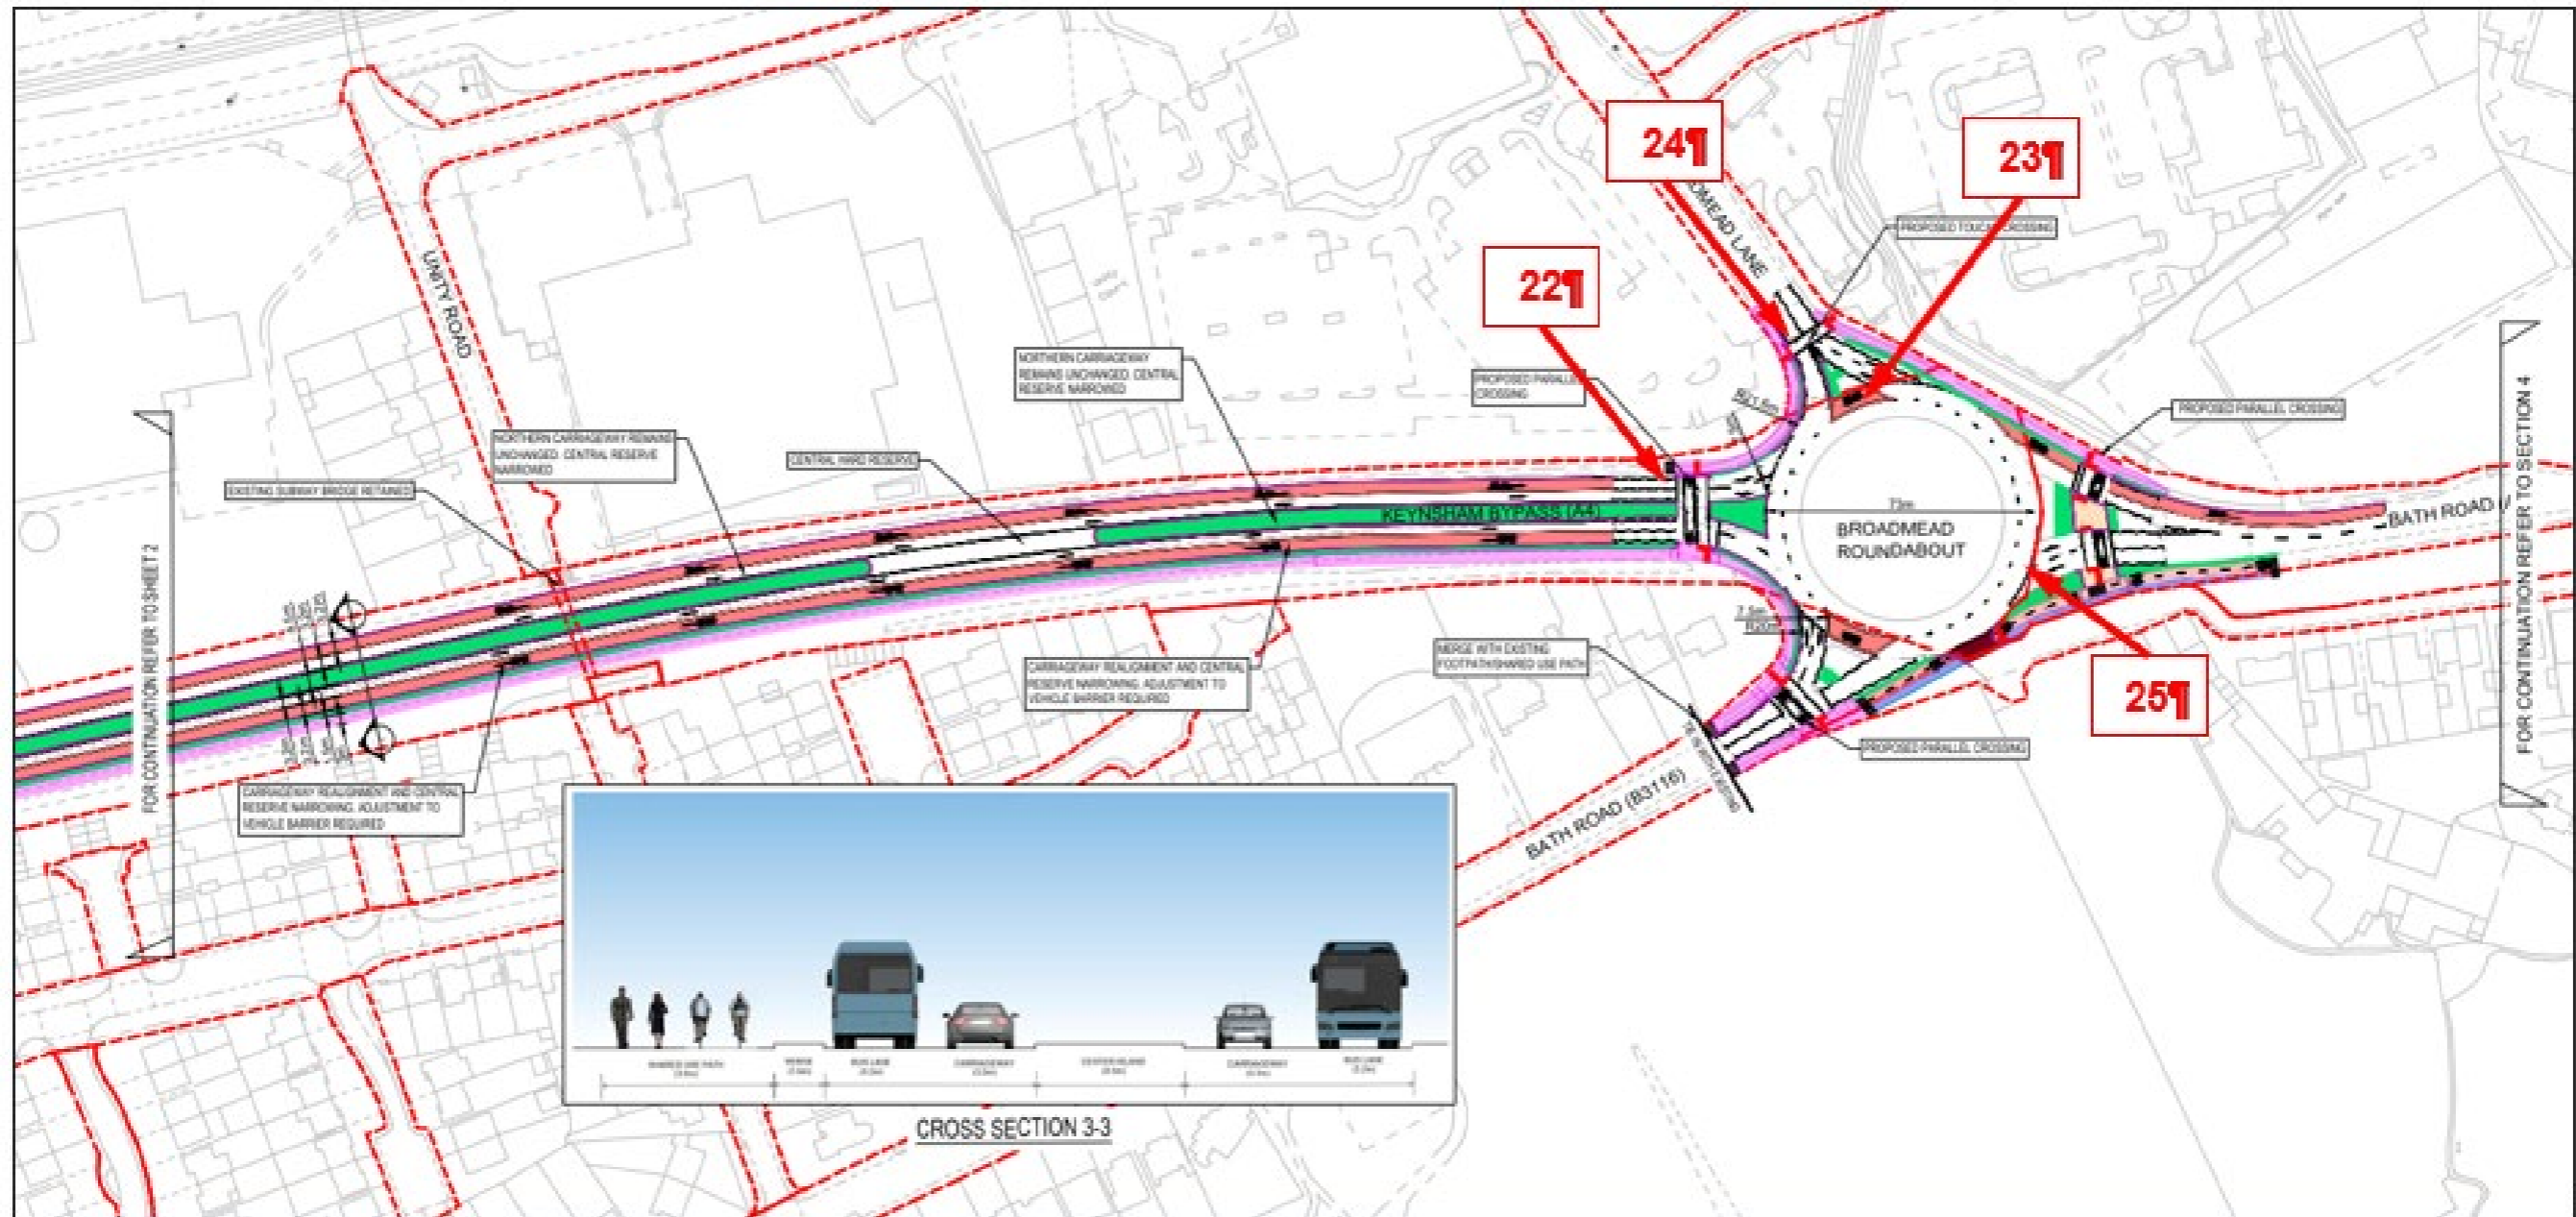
Section 4 Road Safety Audit Problem Location Plan
